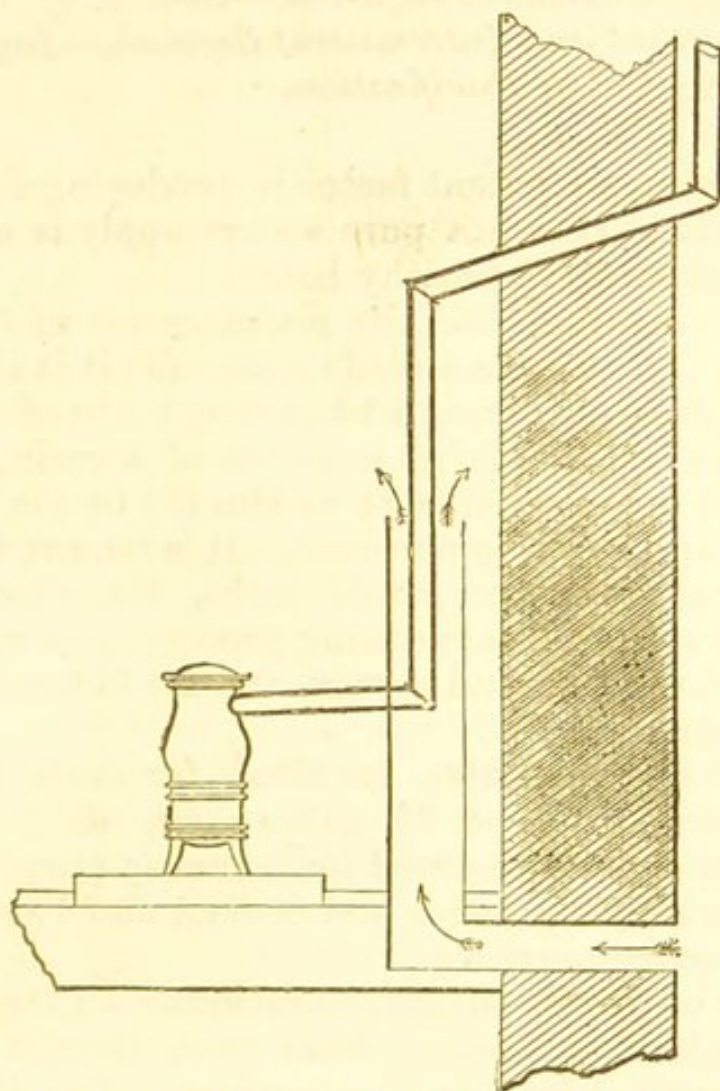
Closed Stove arranged to Warm incoming Fresh Air.
